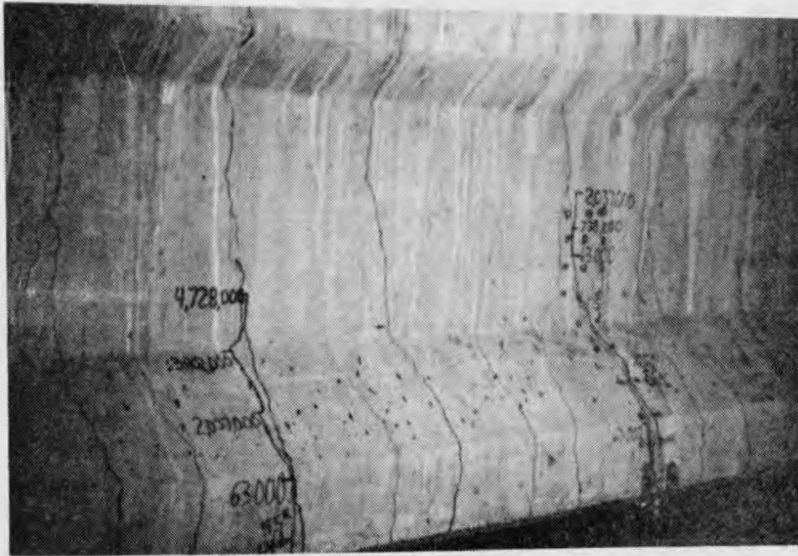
Flexural cracking on the west side of Specimen A-22-NP-3.5-OL-5.95 (NF) after ultimate testing
